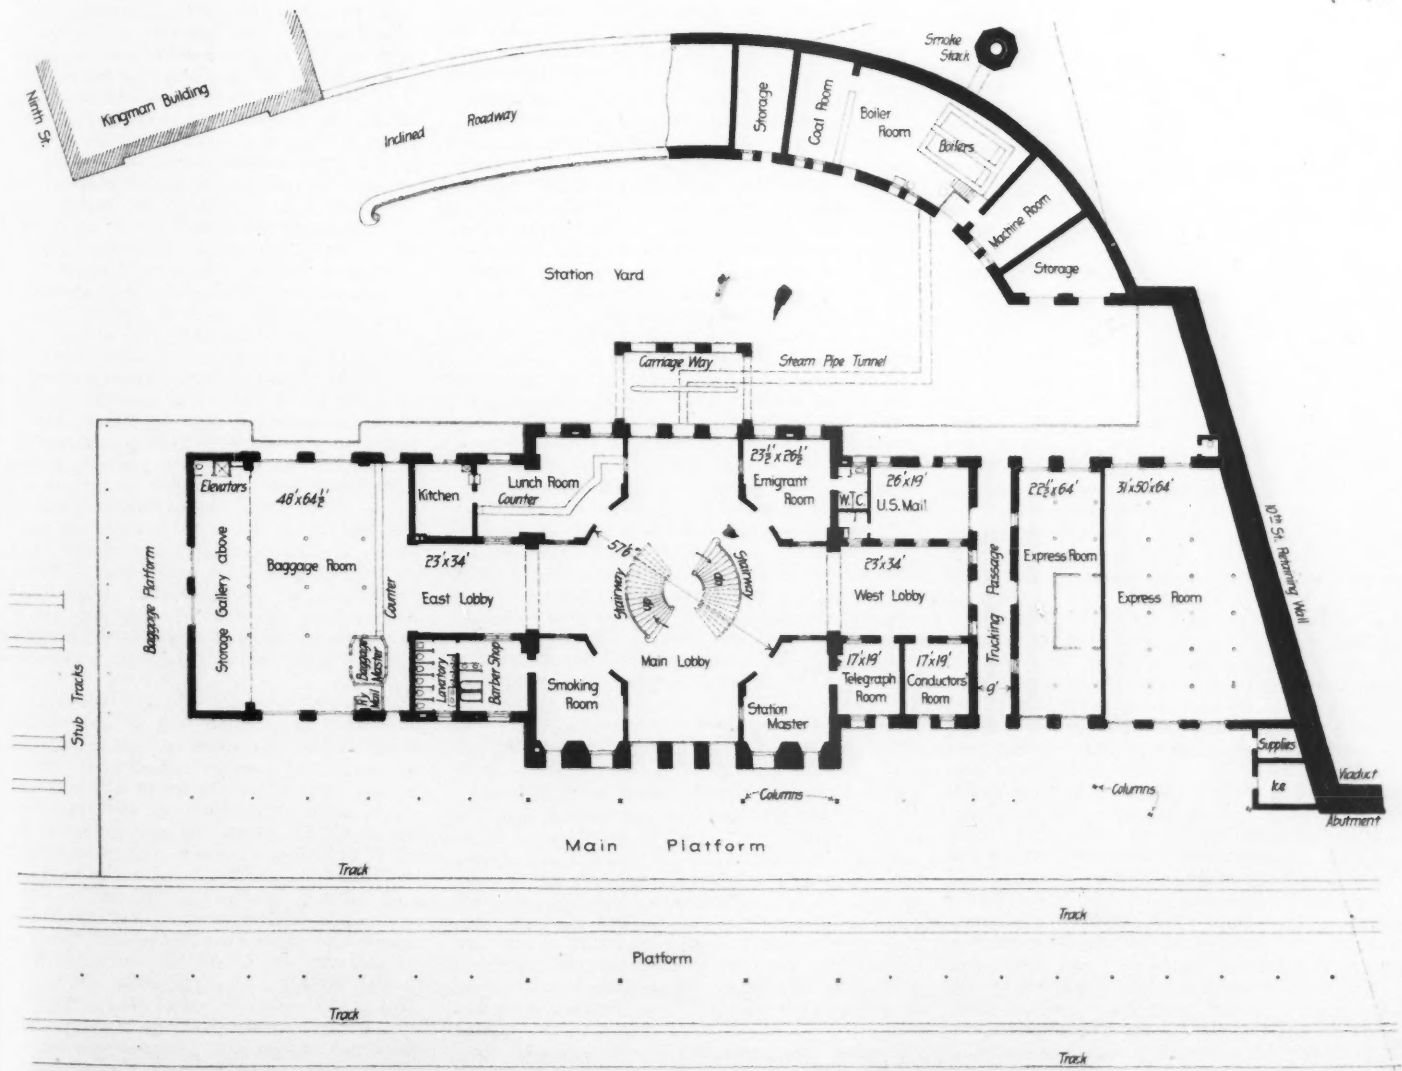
PLAN OF LOWER FLOOR AND PLATFORMS.
